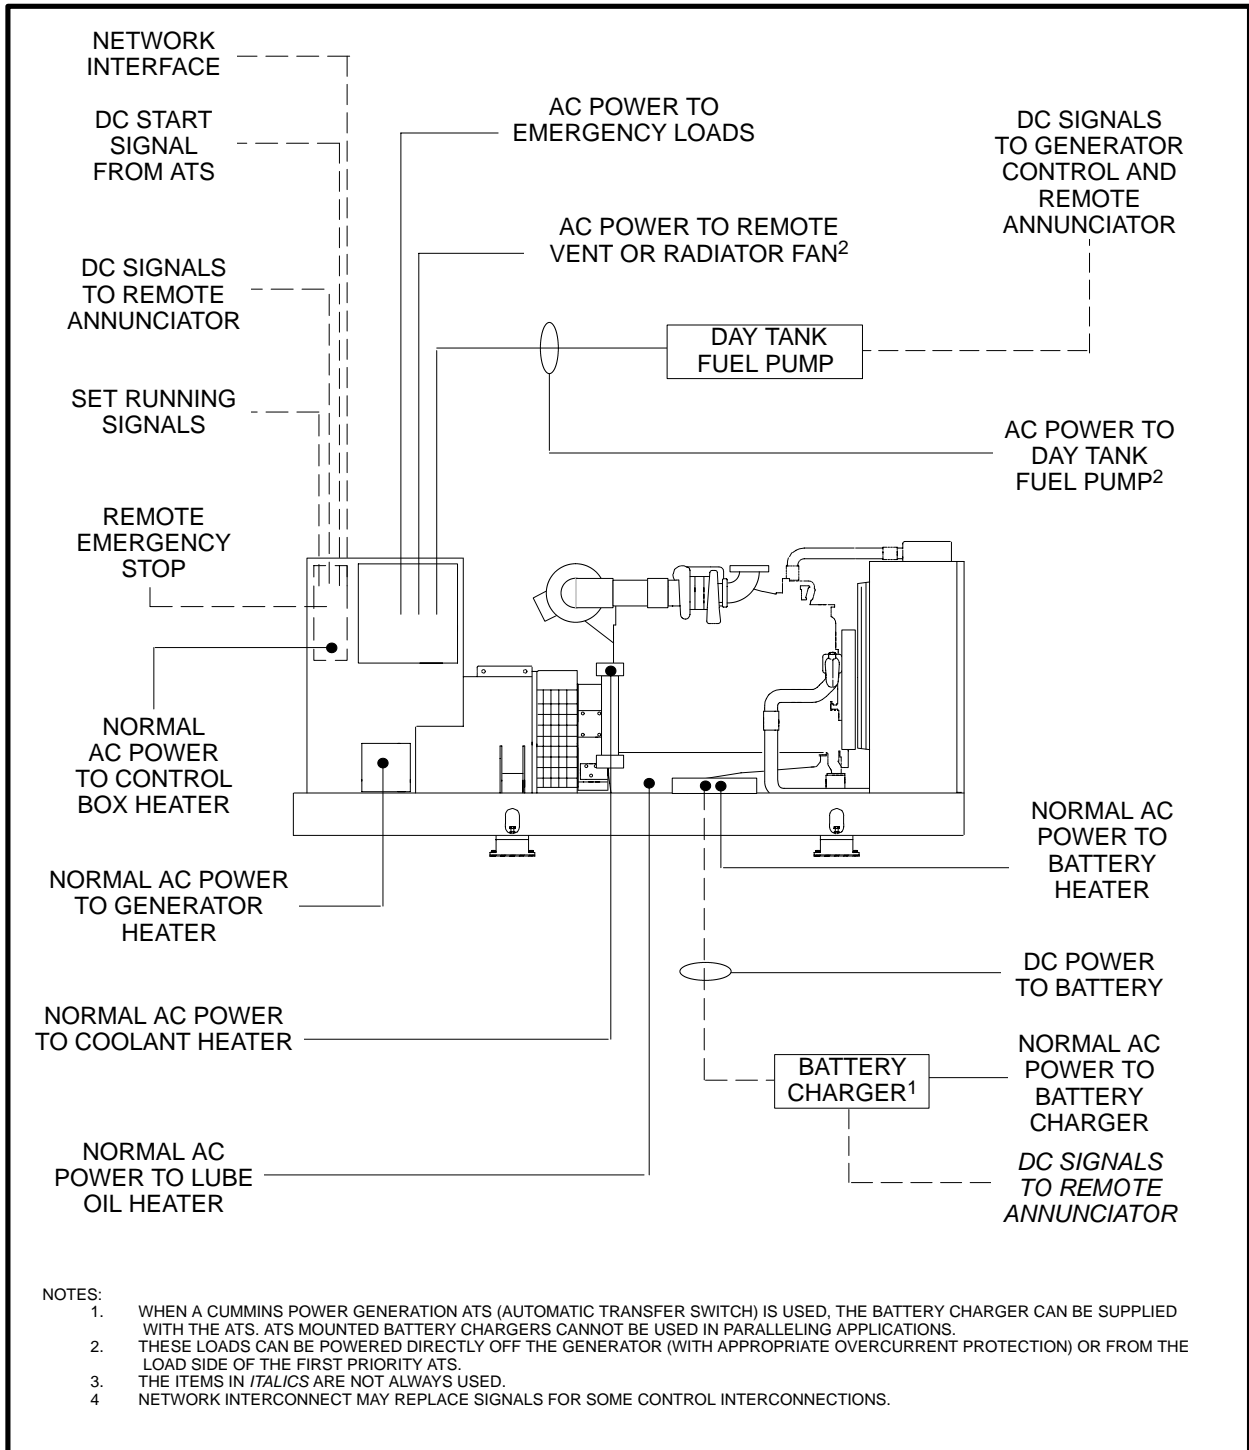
Typical Generator Set Control and Accessory Wiring
